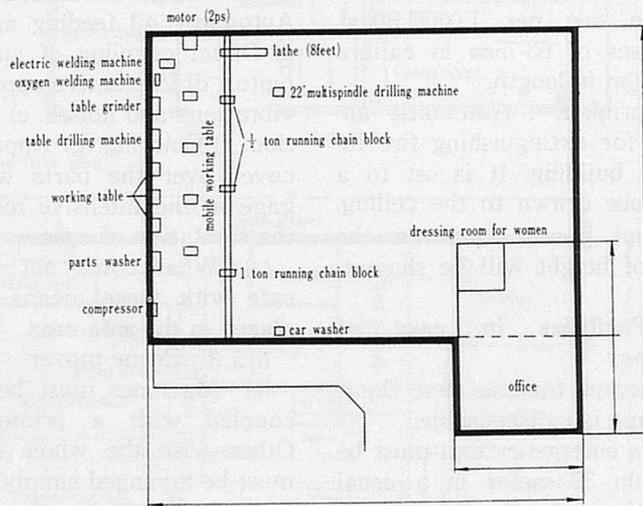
A shop (first class) Space : 608m² (the first floor 370, the second floor 238)
